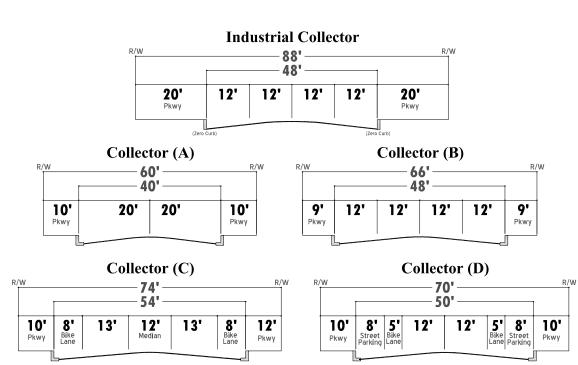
(Page 3 of 3): PROPOSED CITY OF CATHEDRAL CITY GENERAL PLAN ROADWAY CROSS SECTIONS
